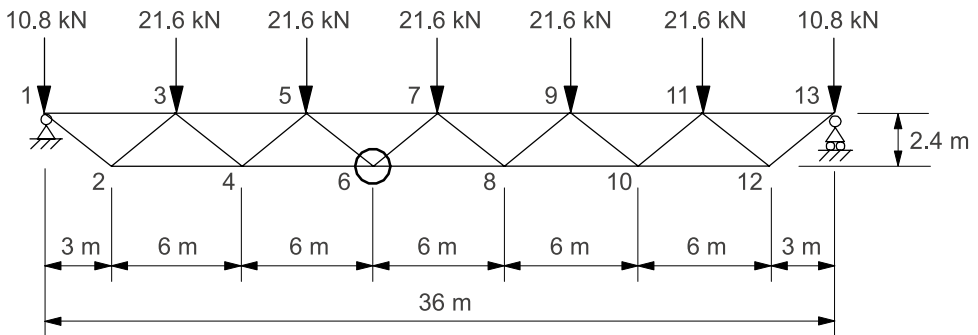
A uniplanar truss subjected to a constant amplitude load range
